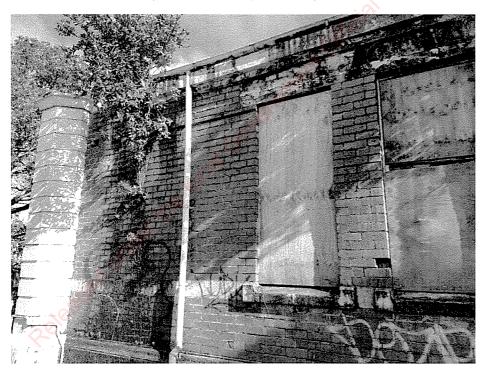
East wall of Old Court House with horizontal crack through concrete lintel
